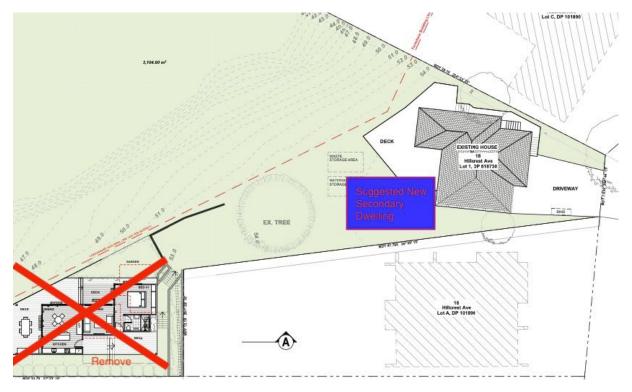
Suggested new location of the proposed secondary dwelling (Source: Amended Plans registered 29 June 2023 / iObject 2023)
